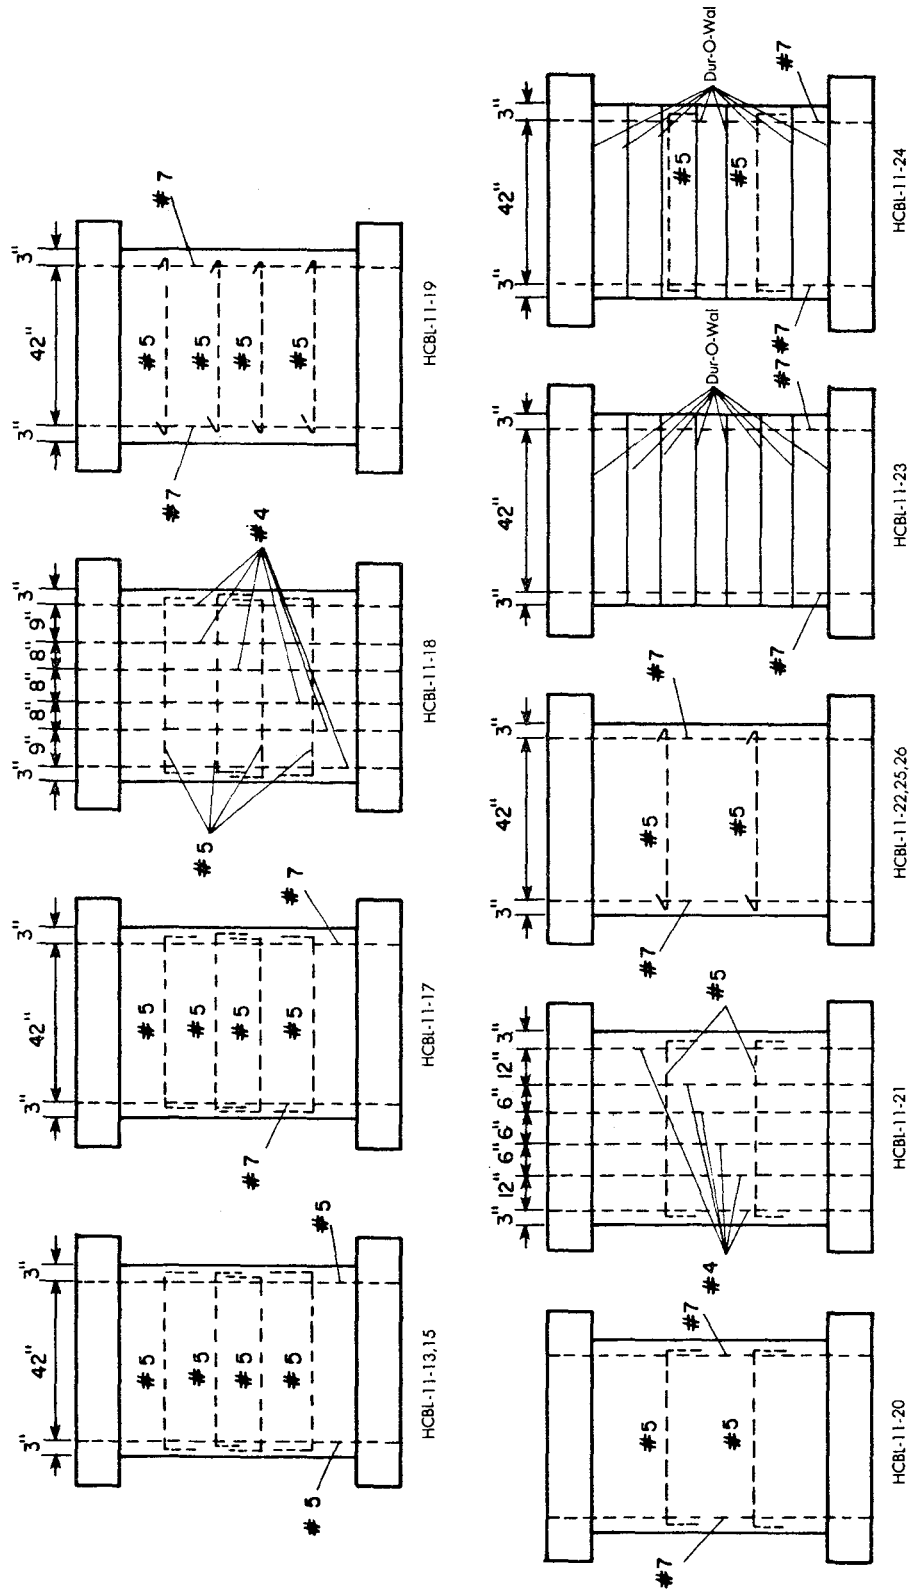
(a) REINFORCING STEEL ARRANGEMENTS FOR HOLLOW CONCRETE BLOCK PIERS (HCBL)
